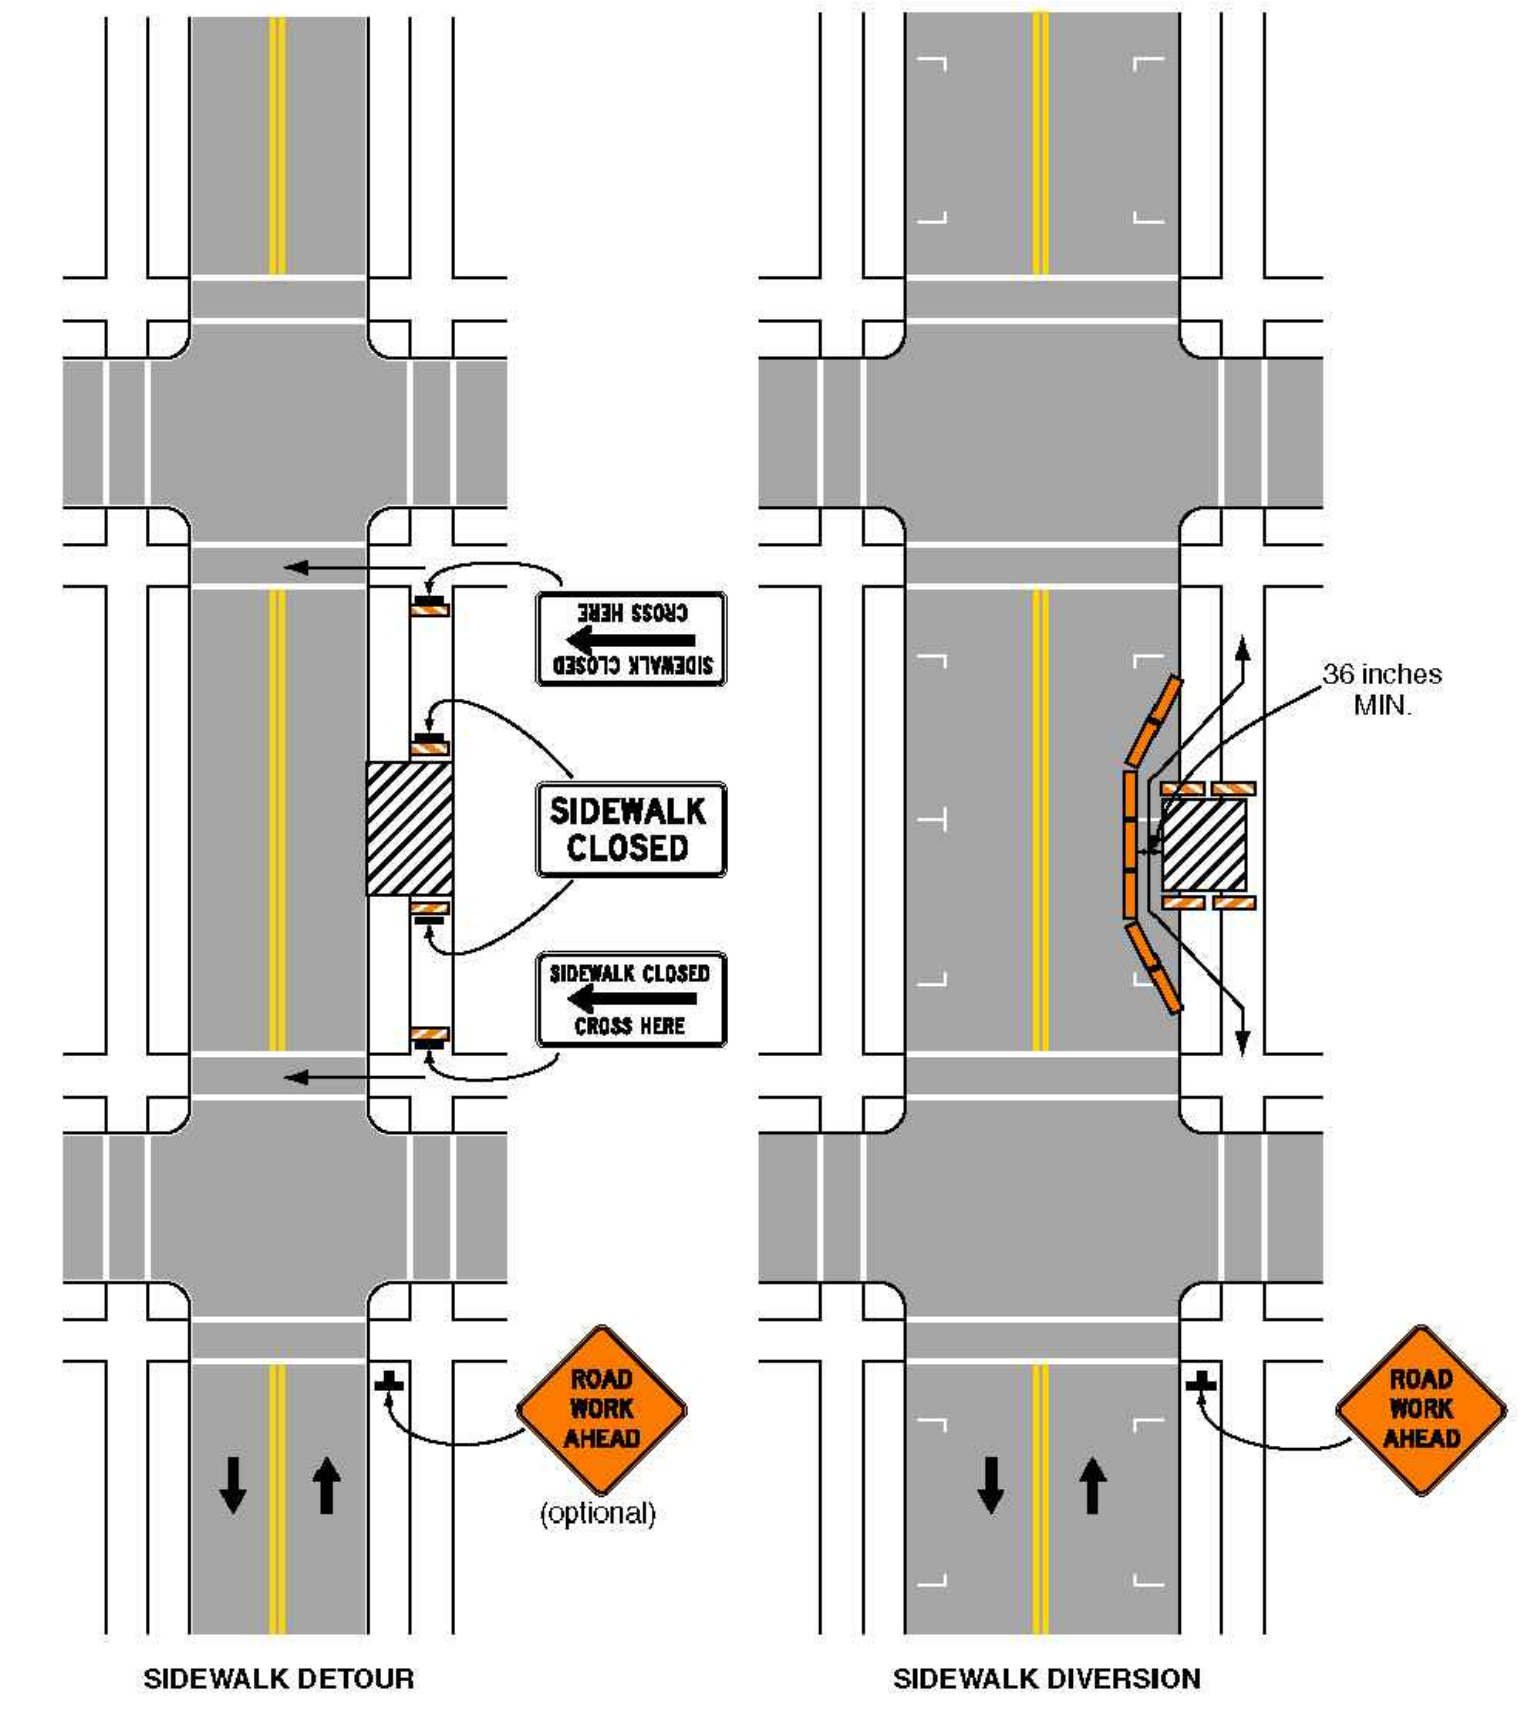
H-28. Sidewalk Detour or Diversion (TA-28)
